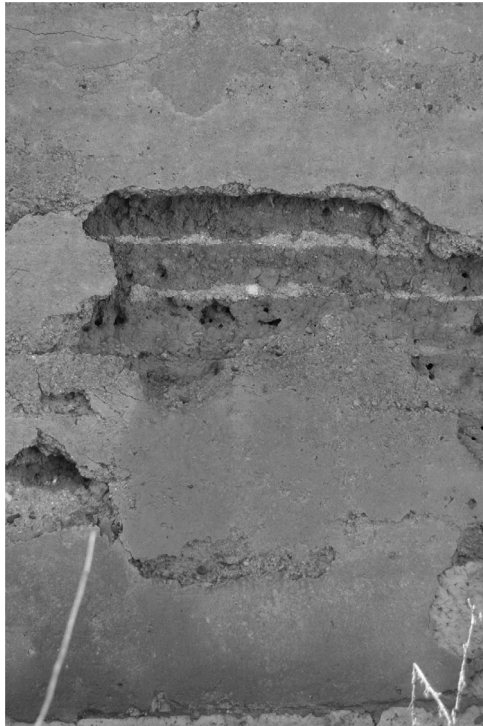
Succession of earth and lime layers in a detail of the previous image.
